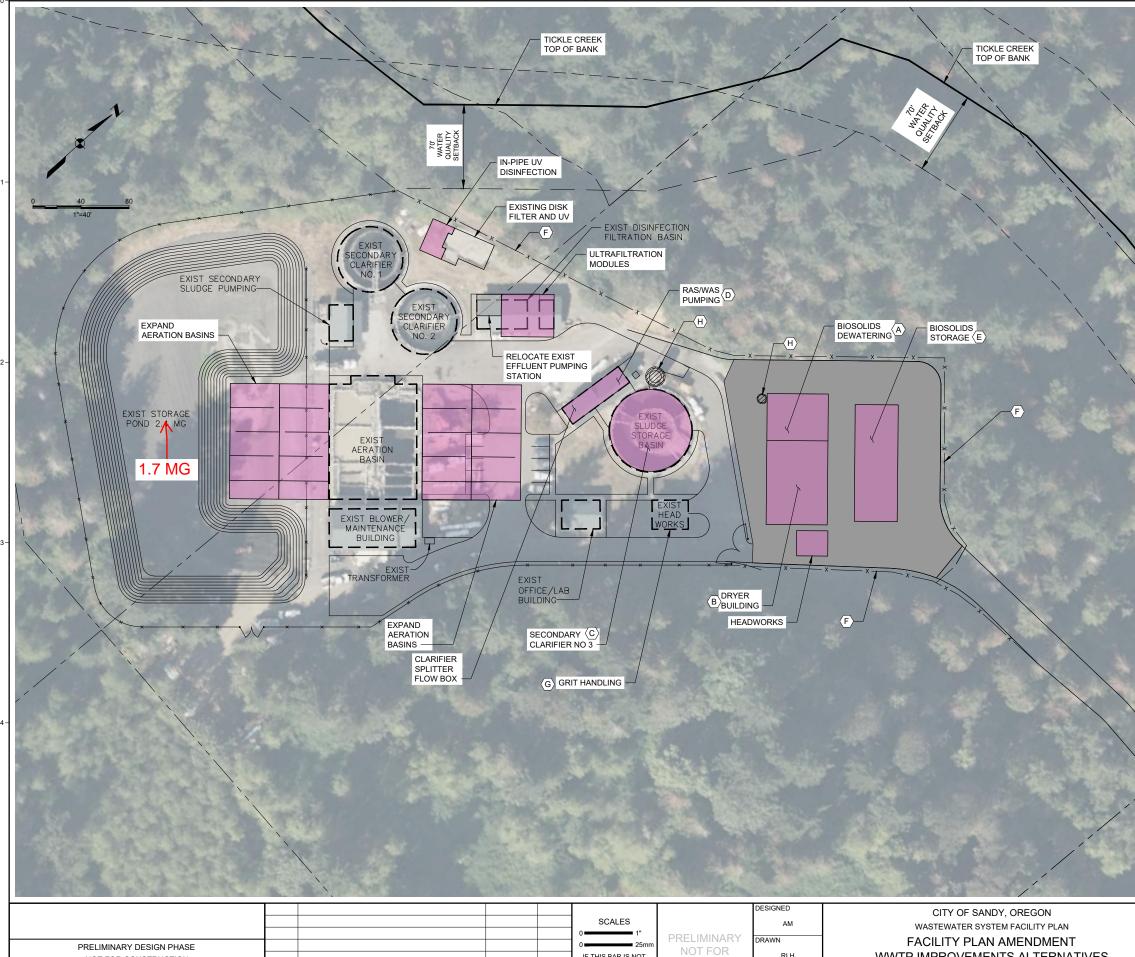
Site Plan Alternative 1 Conventional Activated Sludge Treatment
